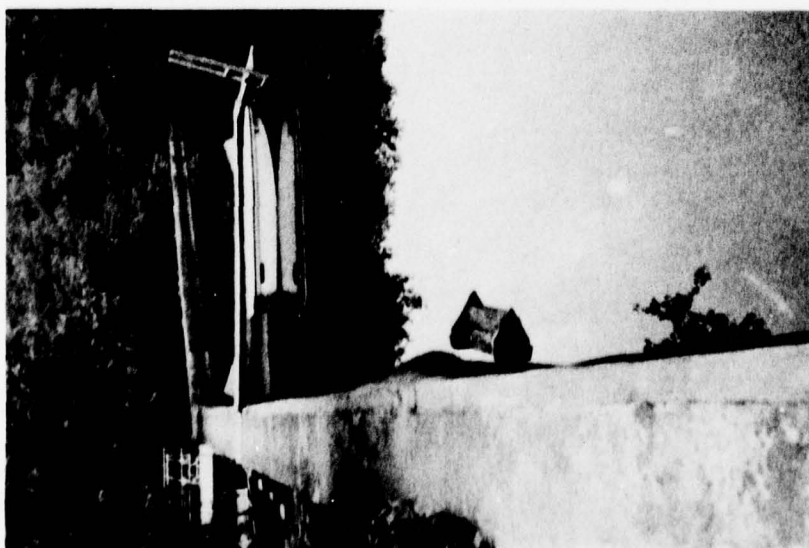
View of dam crest from left abutment showing repair slab on upstream.
